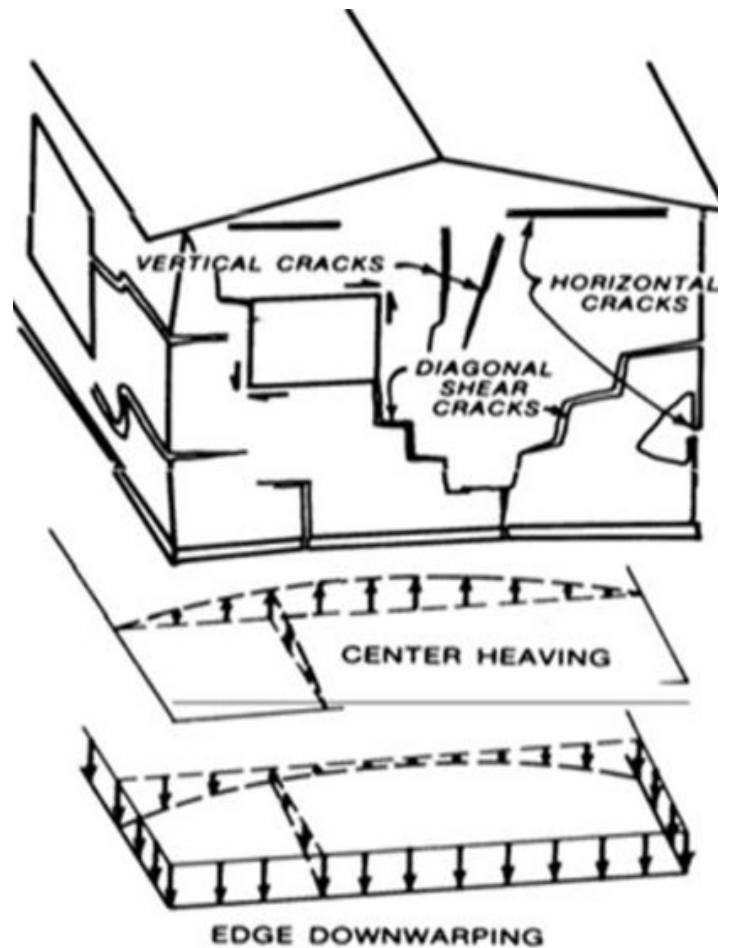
A schematic example of foundation damage caused by swelling soils (Zumrawi et al., 2017)
